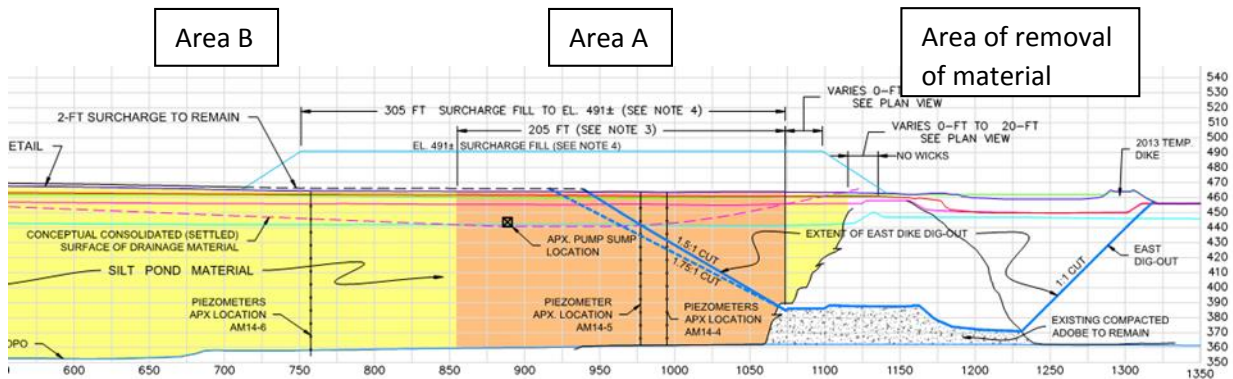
Shows the wick installation areas, A and B as well as the area of mass excavation in section.
